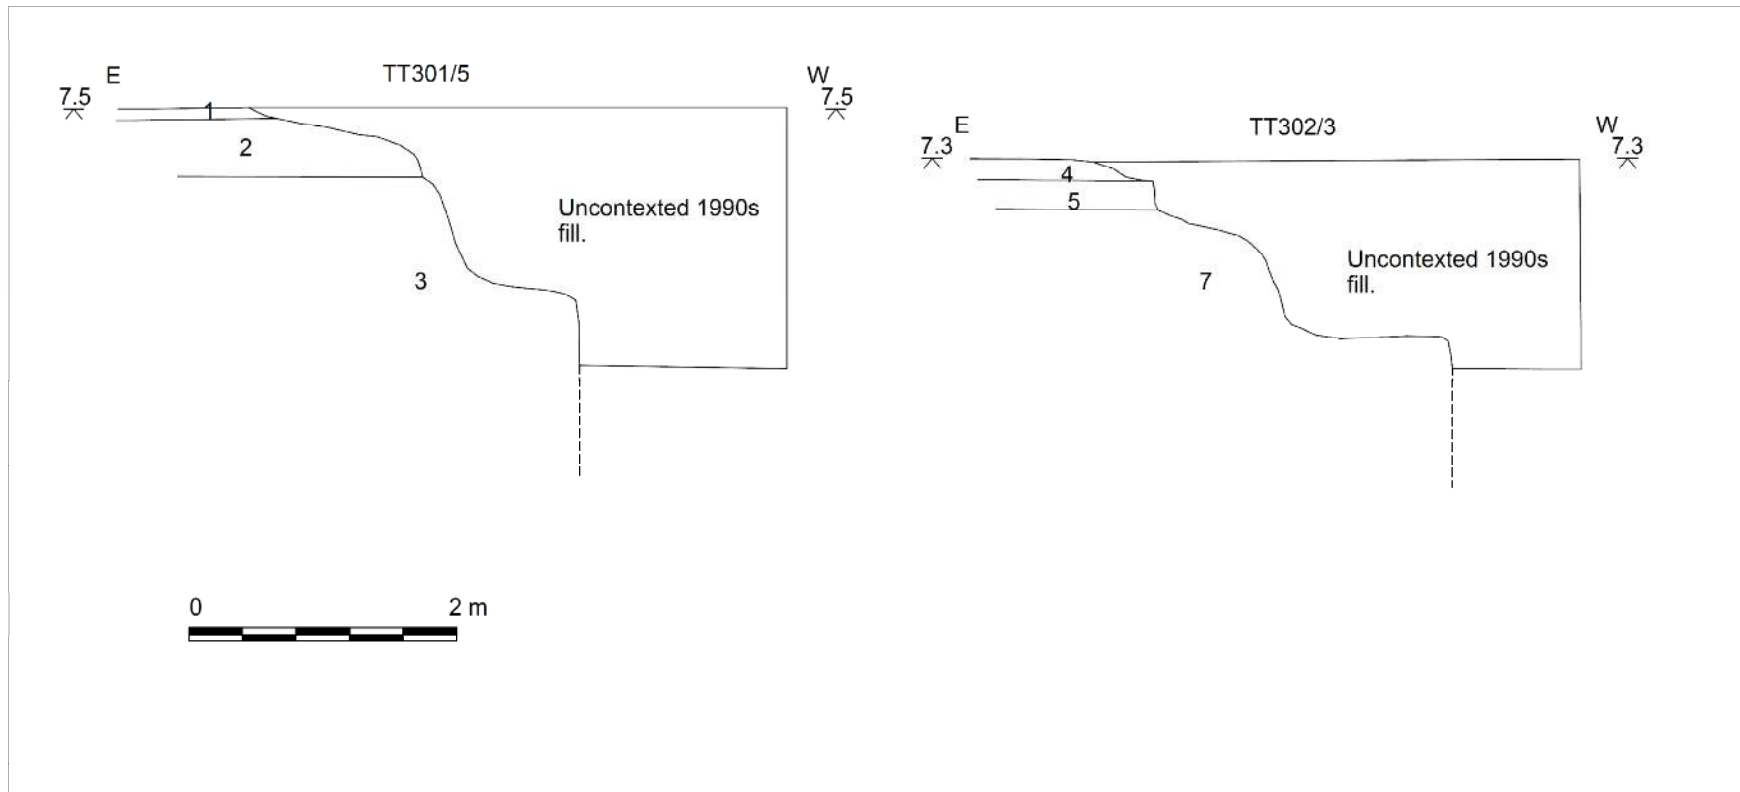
Profile drawings across Princes Dock retaining wall. All heights in metres AOD.
